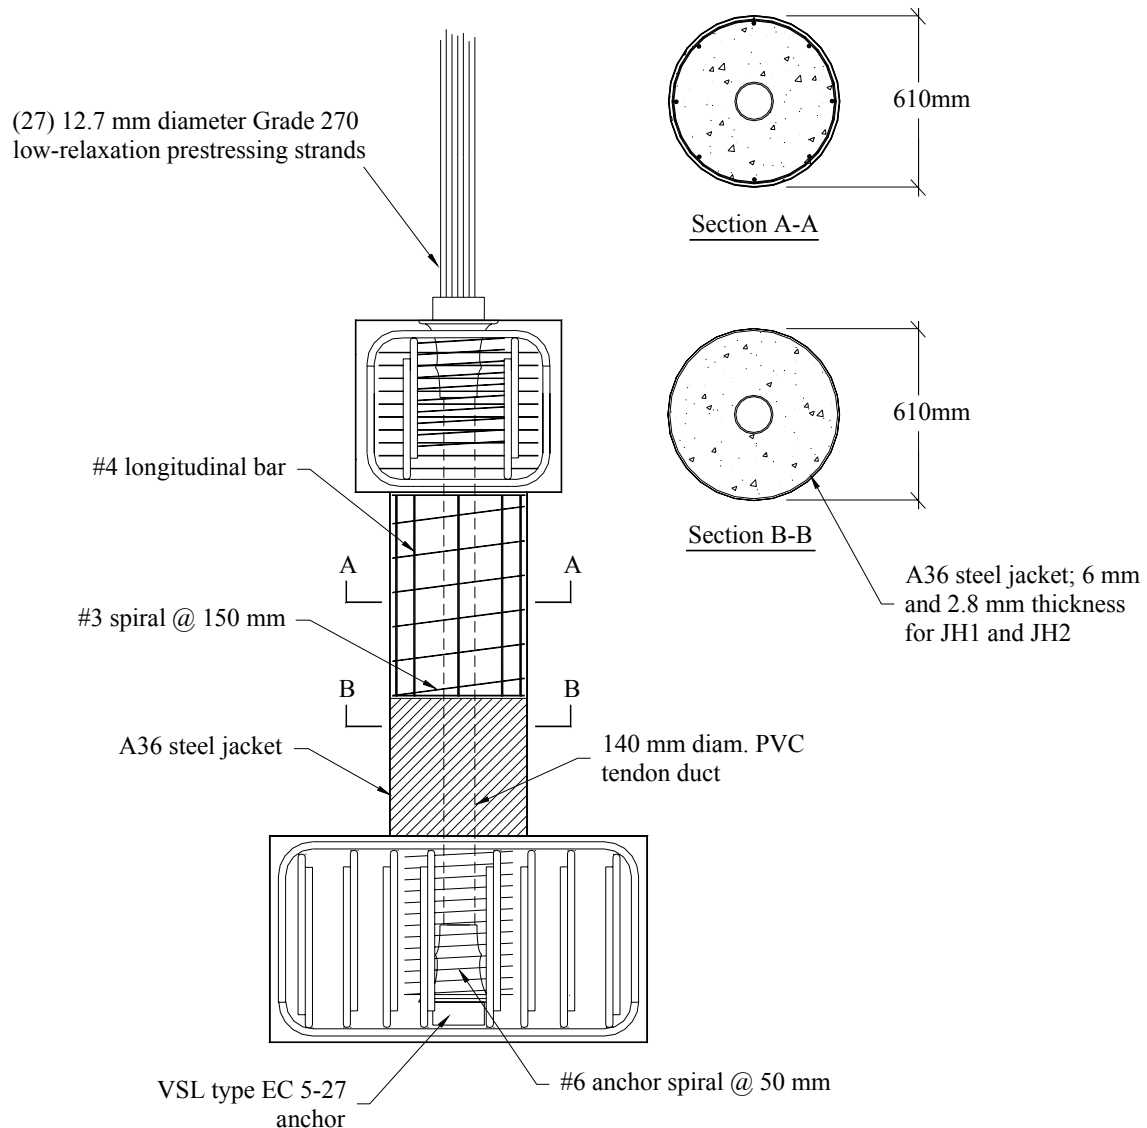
Test unit JH3 and JH4 reinforcement details
